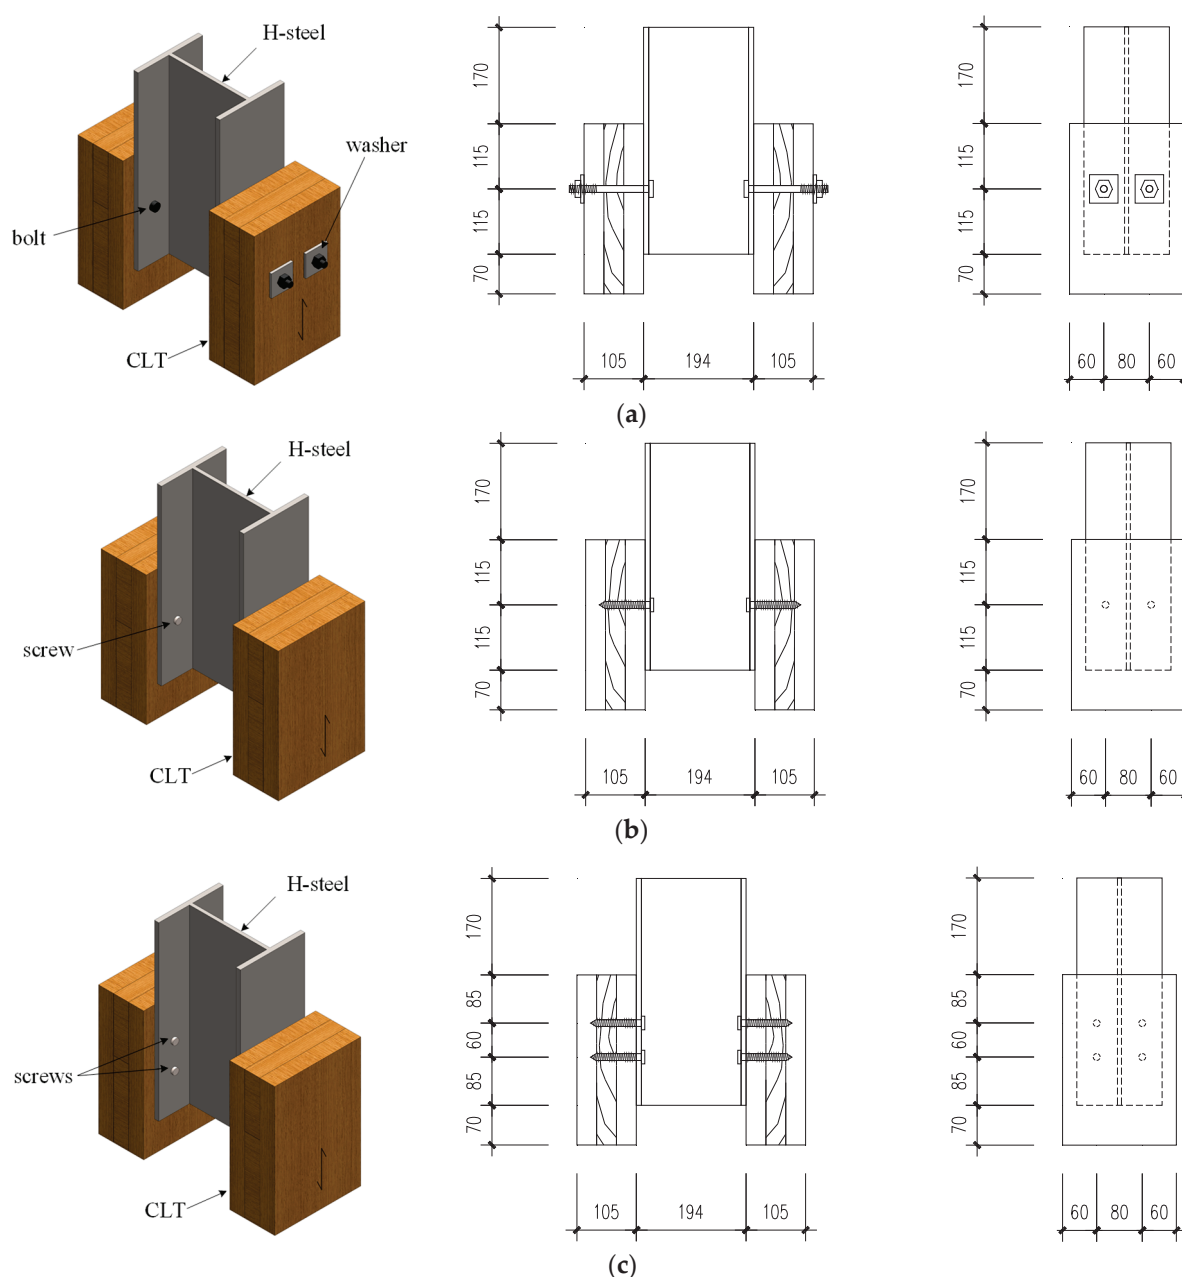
Diagram of push-out test specimens: (a) Specimen with bolts; (b) Specimen with a single-row of screws; (c) Specimen with double-row of screws.
